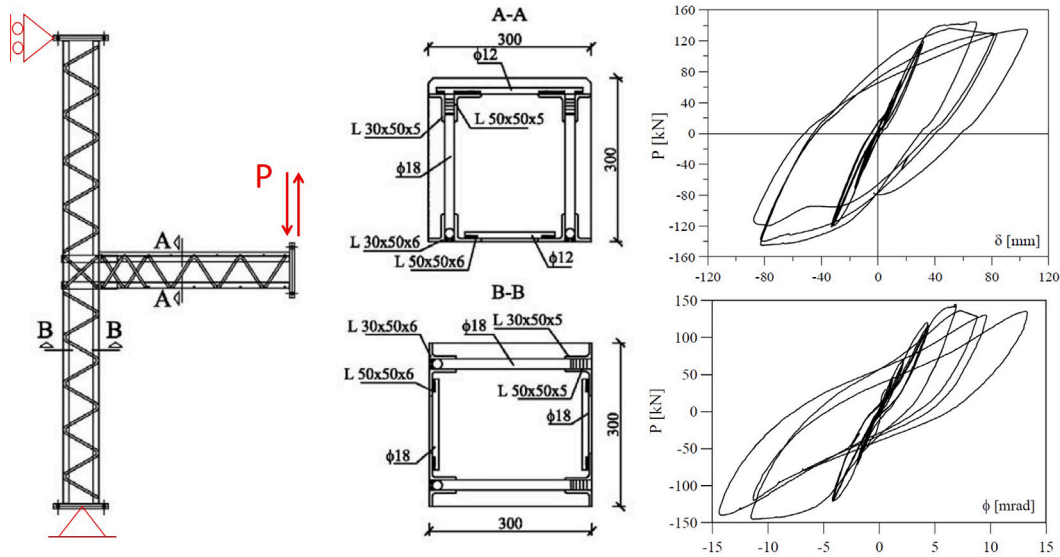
Specimens of the joints tested by Amadio et al. [26] (dimensions in mm).
